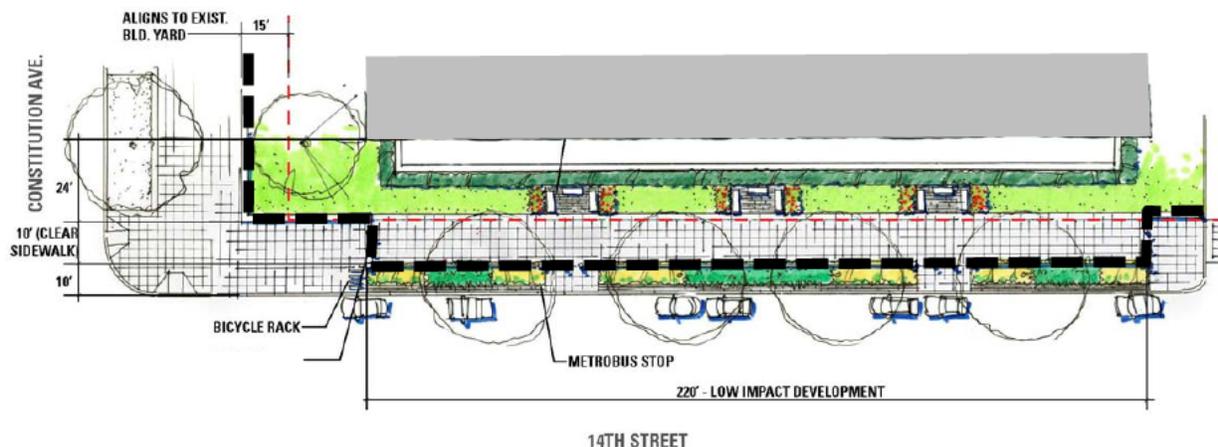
Revised Concept Site Plan Detail - Corner of 14th Street, NW and Constitution Avenue
